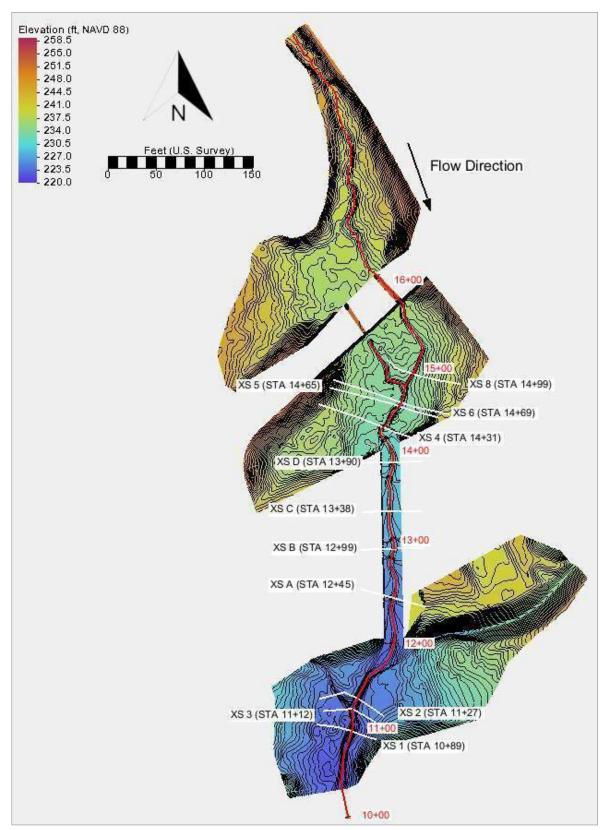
Locations of cross sections on proposed alignment used for results reporting
